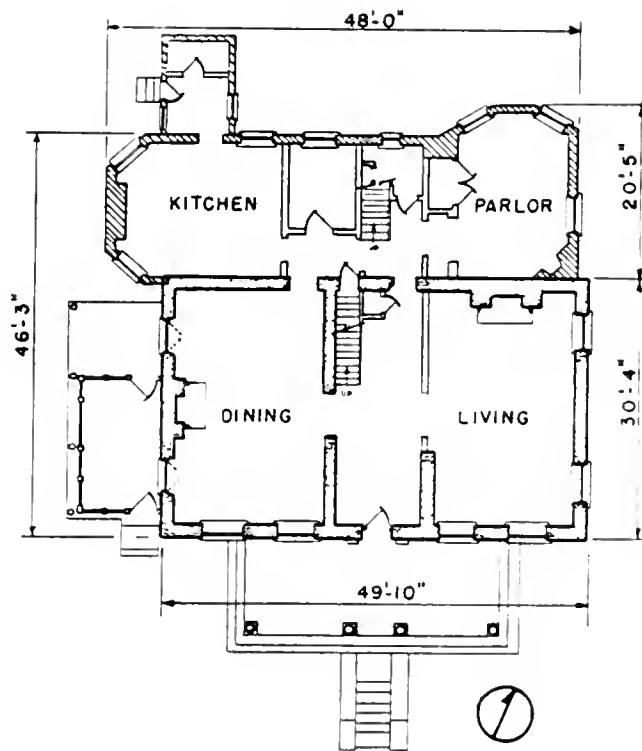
Floor plan of first floor of Loudoun. From, Harry M. Tinkcom, Historic Germantown, Philadelphia, 1955, p. 35. This plan shows the first floor in its final configuration in 1939. The area to the north, indicated by hatched lines was added in 1888 and designed by the Philadelphia architect George Pearson.
